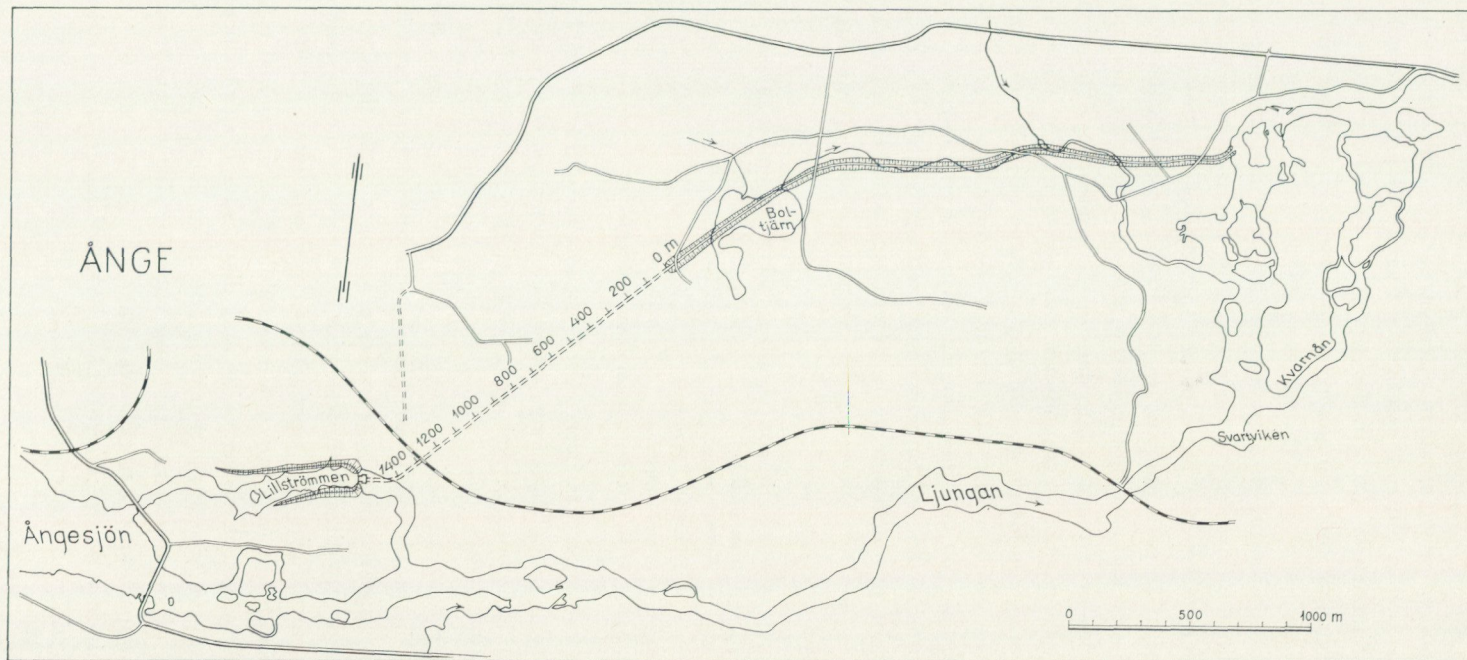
The outlet tunnel (0—1400 m) and canal of the Parteboda power plant.
